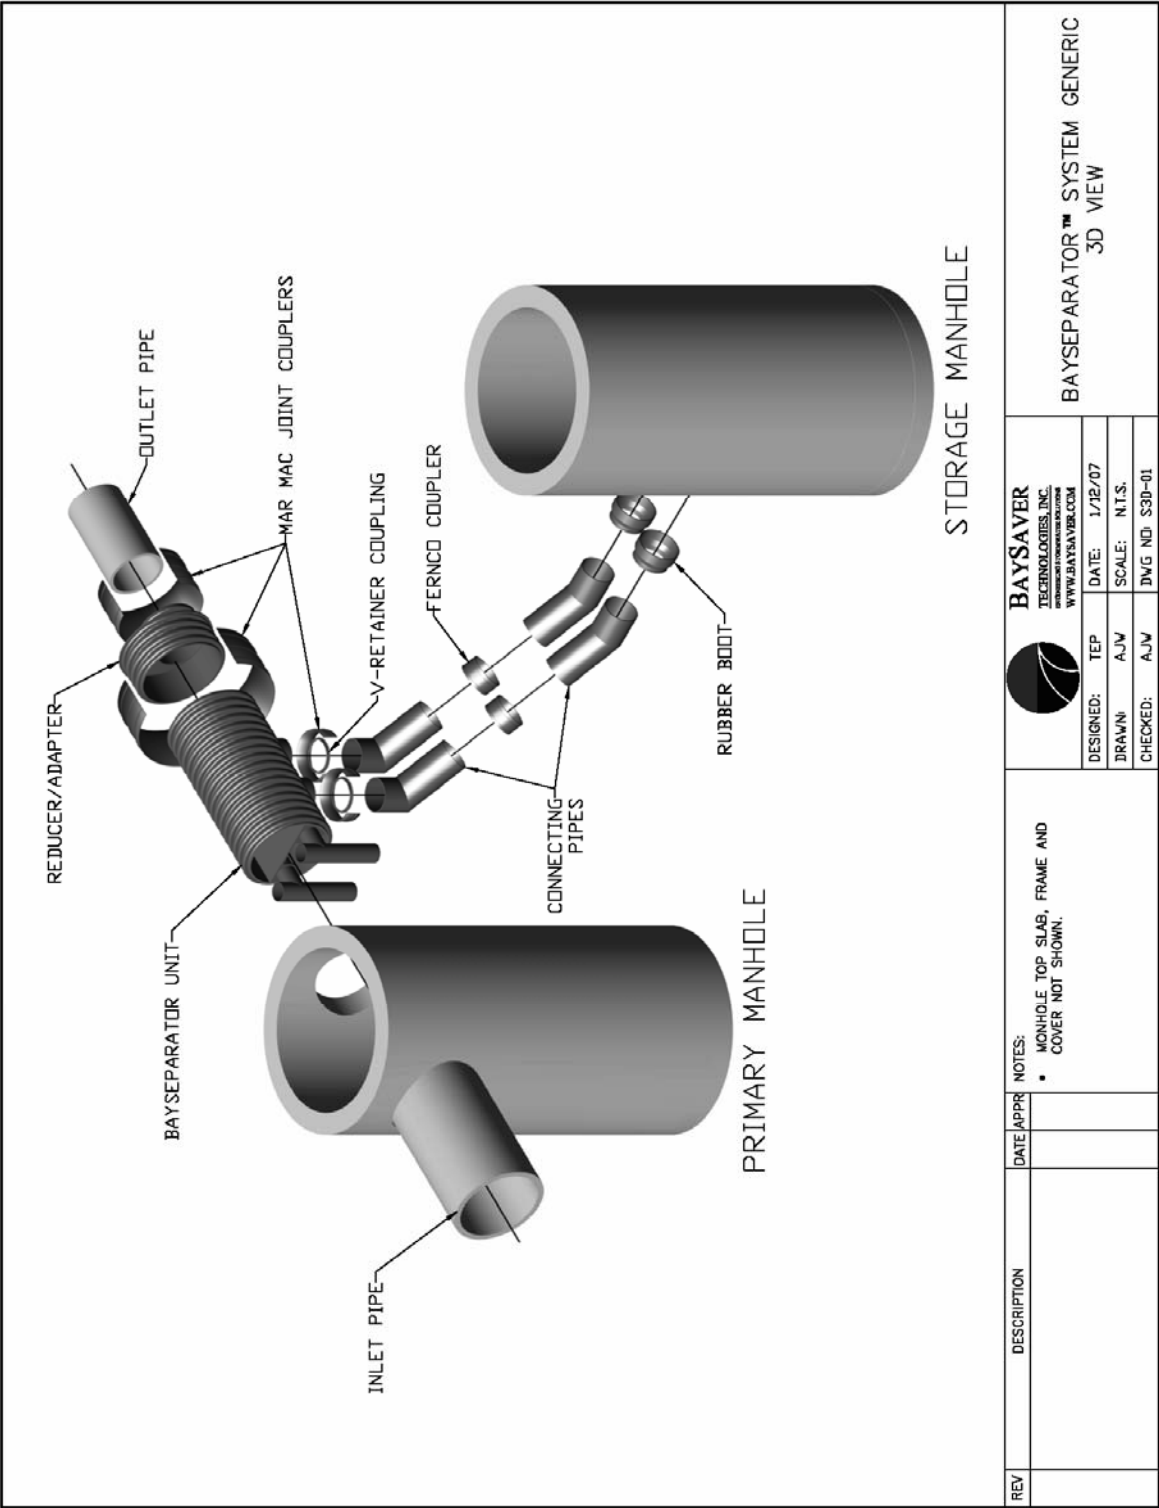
Exploded View of Standard BaySeparator™ System Components
